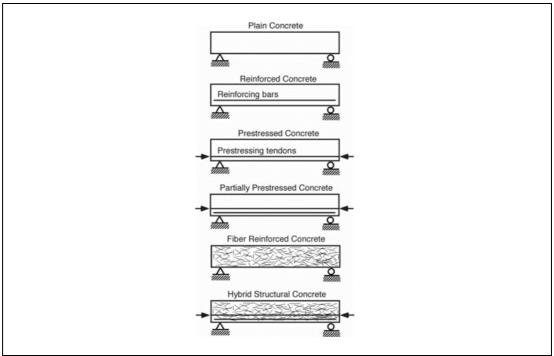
Forms of Structural Concrete (Naaman, 2001)
